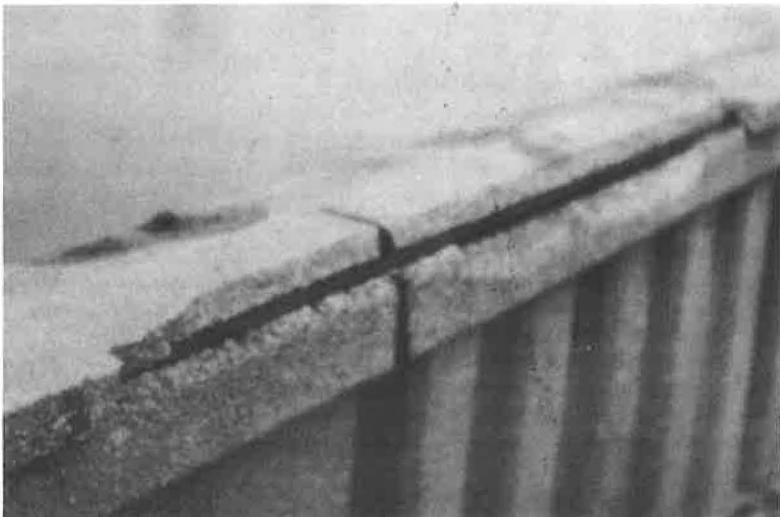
Sidewalk railing before repair, 112th St. Bridge, Troy.
